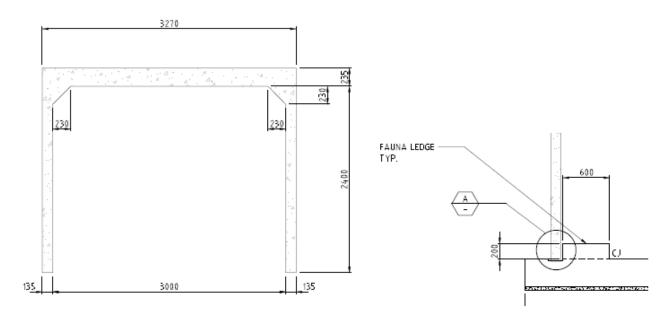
Cross section of the proposed culvert at Badgery's Creek
